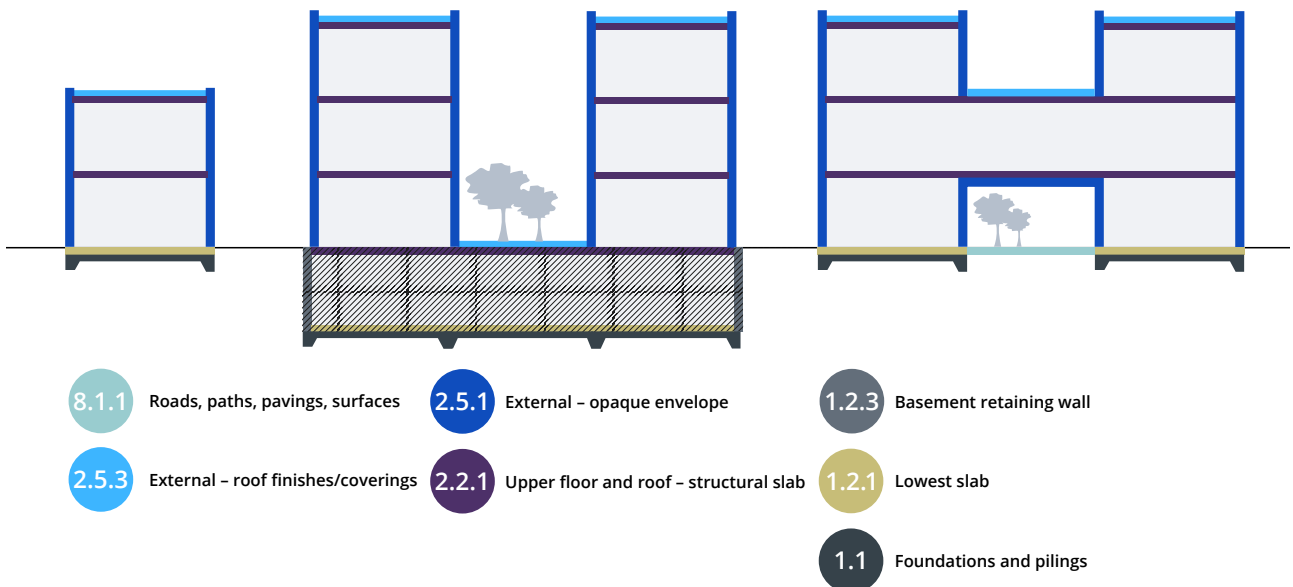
Example of how external envelope and roof finishes should be measured across different building types
